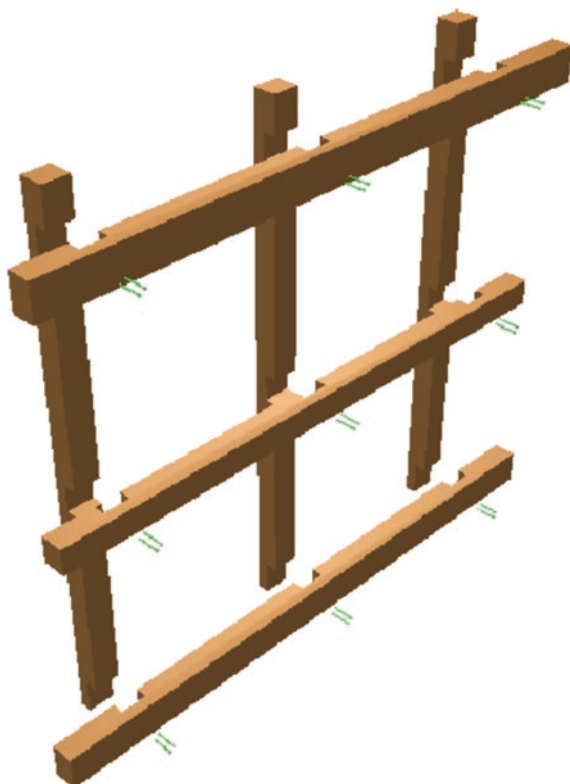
Cross-halving connections reinforced with screw-nails
